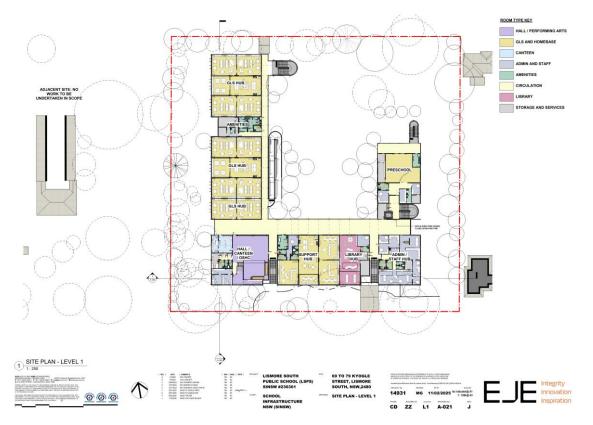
Proposed Level 1 Floor Layout (Source: EJE Architecture)
